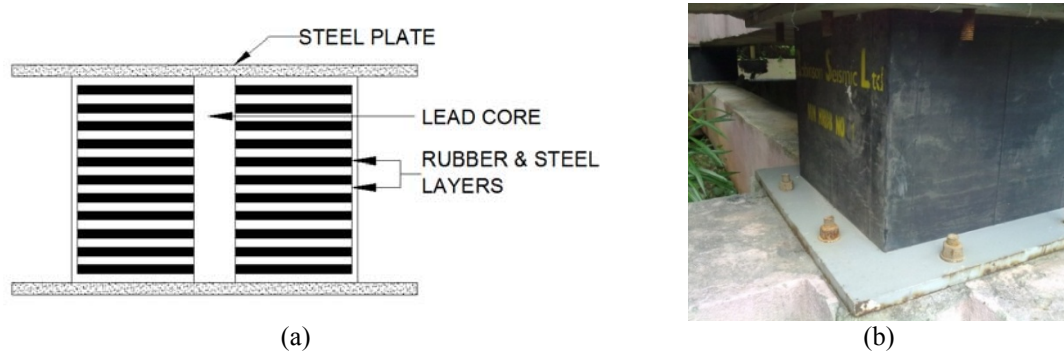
(a) Cross section of LRB used at site and (b) LRB connected with bolts to prototype isolated building
